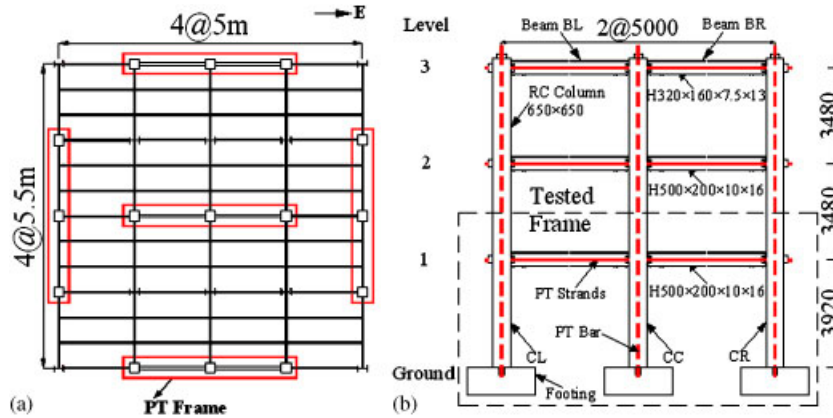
Three-story prototype PT building: (a) plan and (b) elevation.
